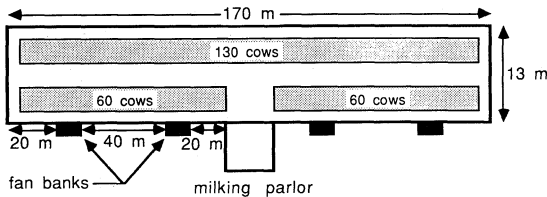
Plan view of dairy barn considered in Example 8-7.
